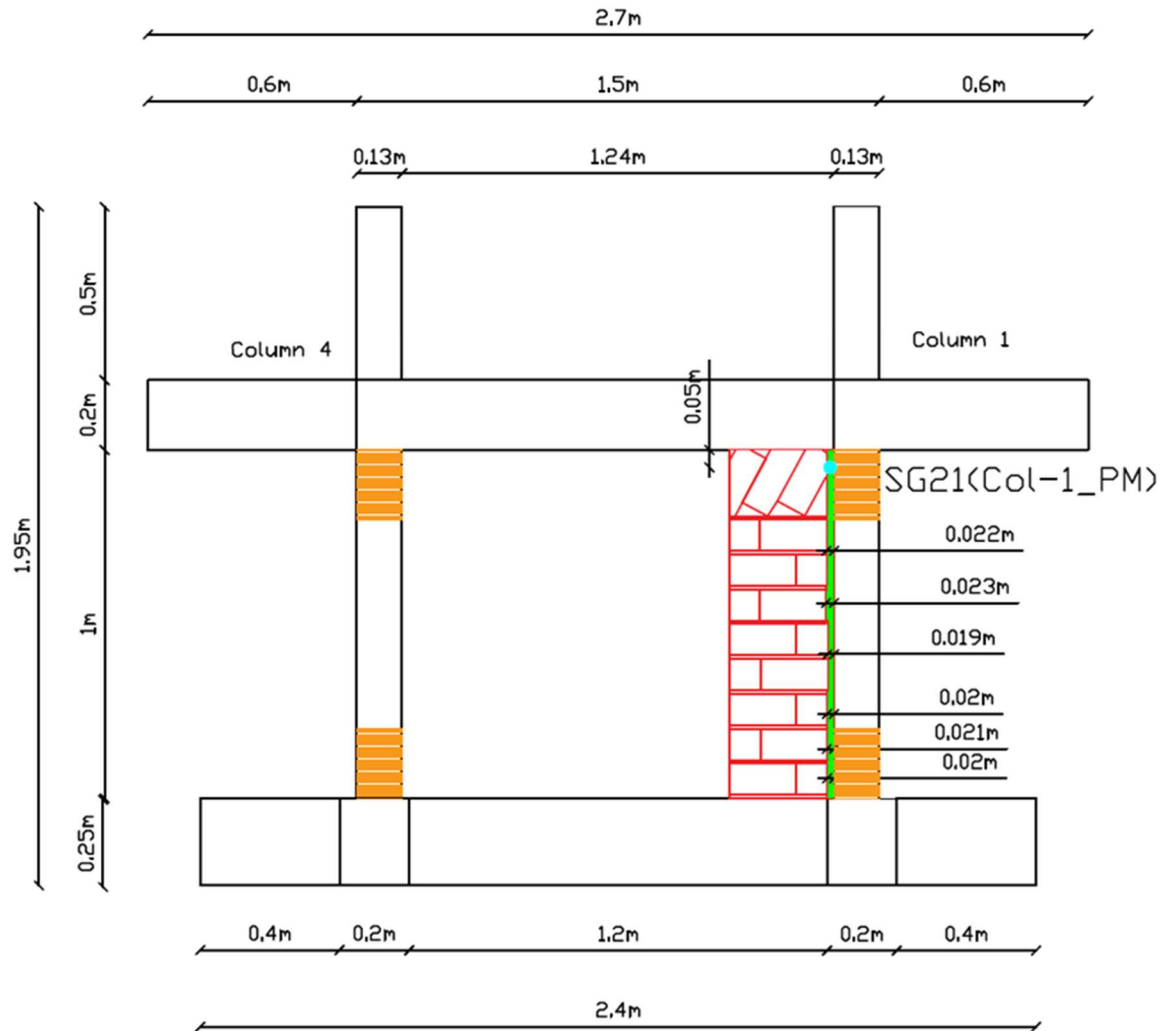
Cross section of the structure with strain gauge SG21 in frame of columns 4-1
